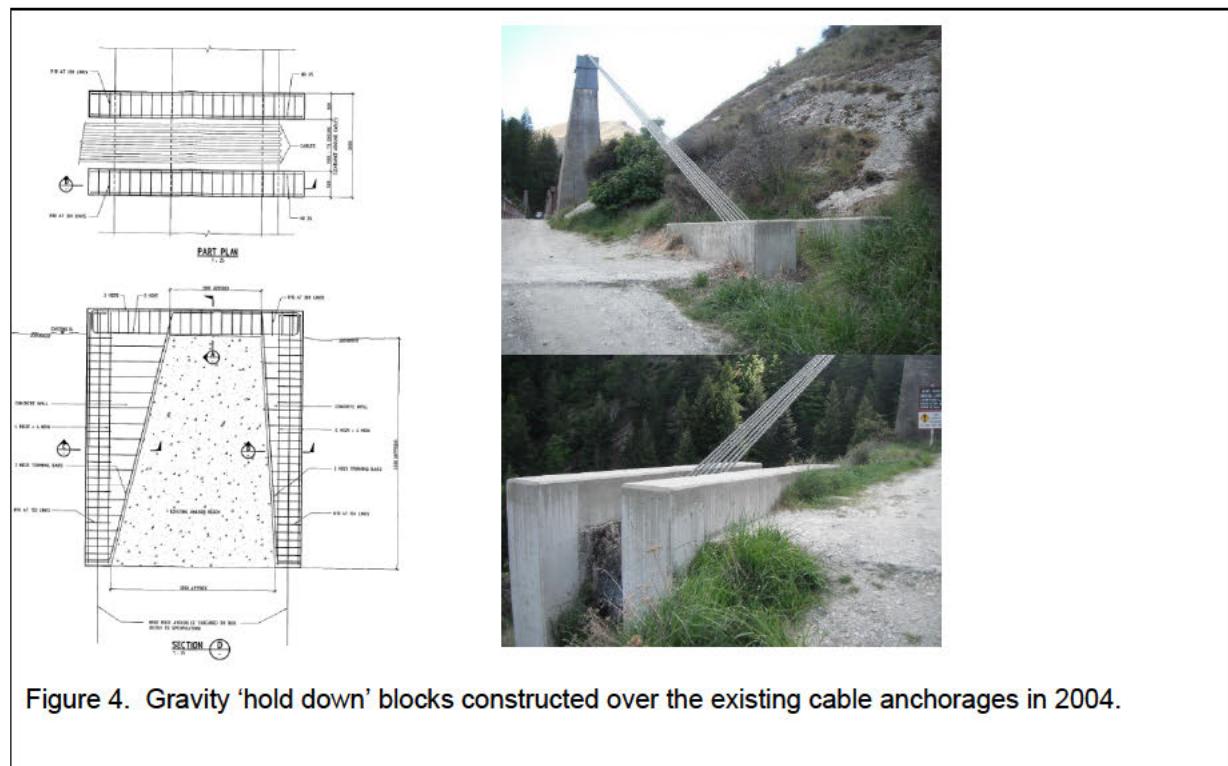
Gravity 'hold down' blocks constructed over the existing cable anchorages in 2004.
